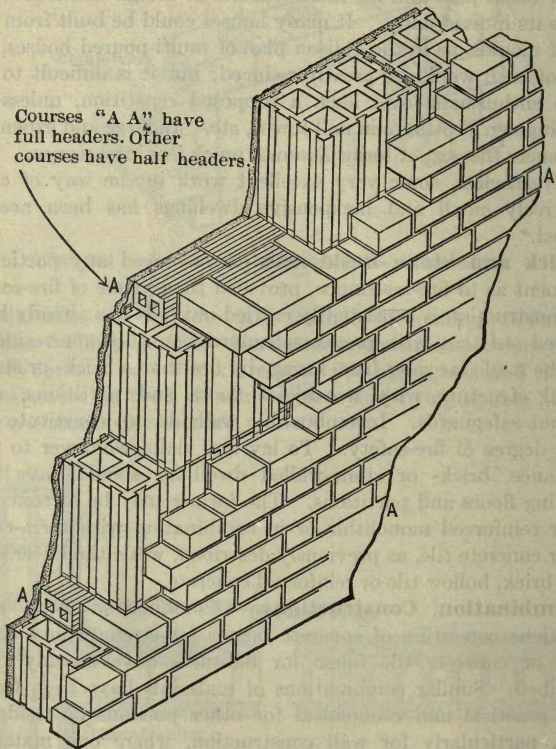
Construction of Hollow Tile Wall with Brick Facing.
